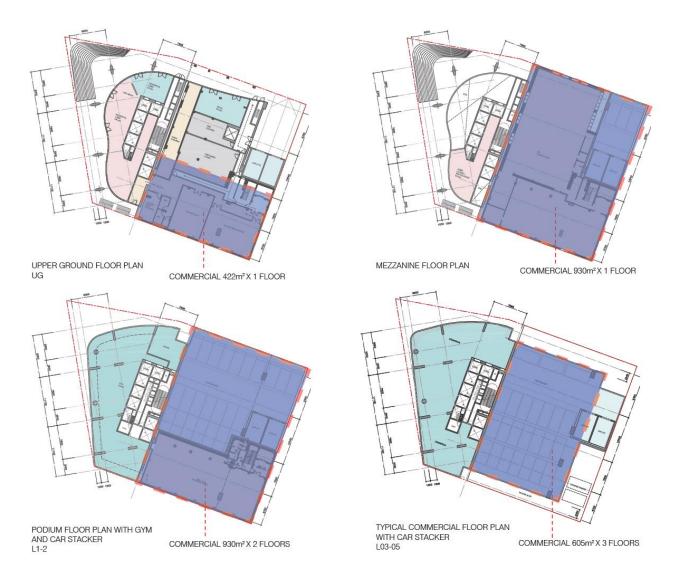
Potential commercial floor plates without Telstra Exchange building Source: PTW
